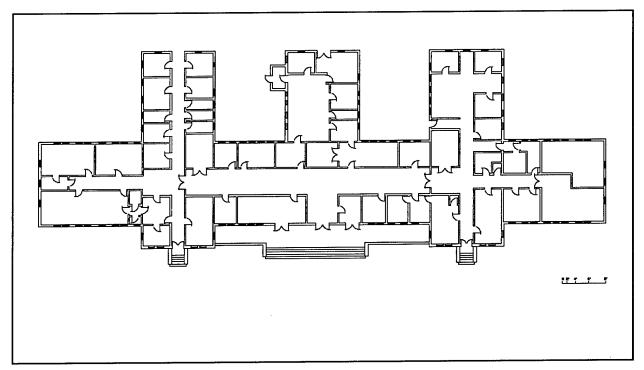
Example of a Georgian Revival quarters floor plan (Building 2006).
